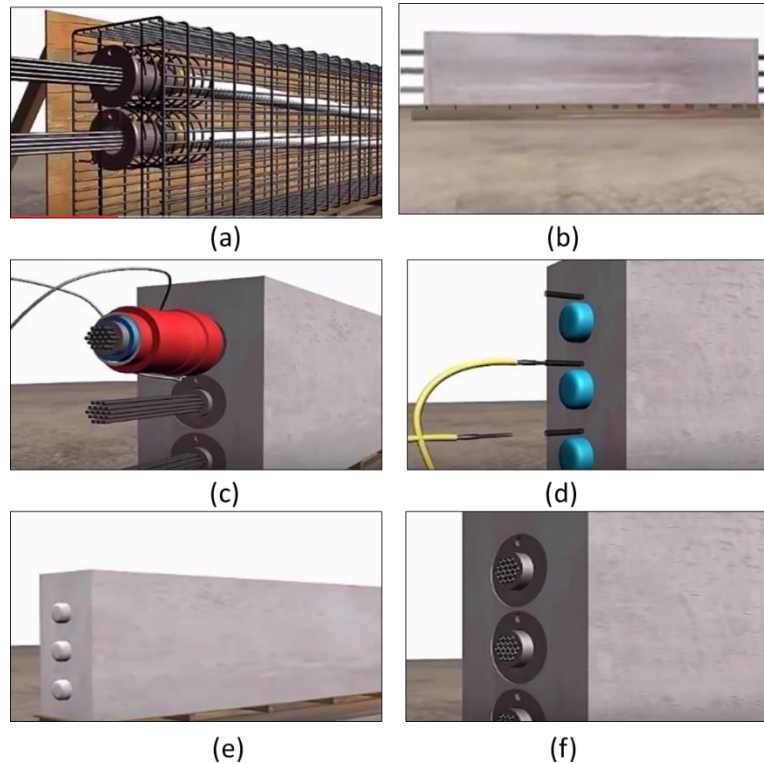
Process for the manufacture of a bonded prestressed RC beam with post tension system (a) Placing prestress cables, (b) Concreting and hardening of concrete, (c) Anchoring process, (d) Grouting process, (e) Hardening of the concrete beam, (f) Anchoring detail [15]
